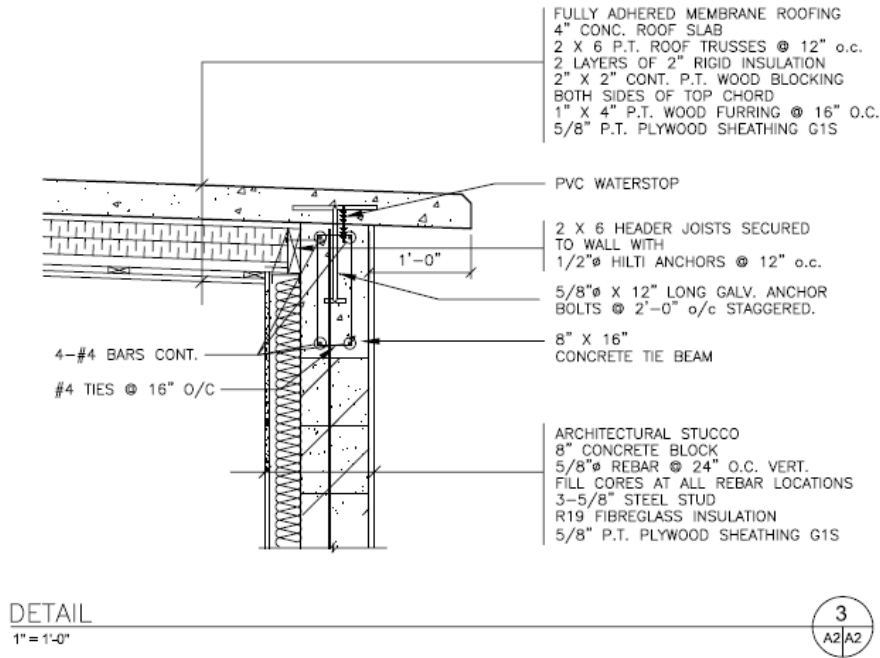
; TYPICAL EQUIPMENT BUILDING STRUCTURAL DESIGN - DETAILED OVERVIEW OF KEY STRUCTURAL DESIGN AREAS
